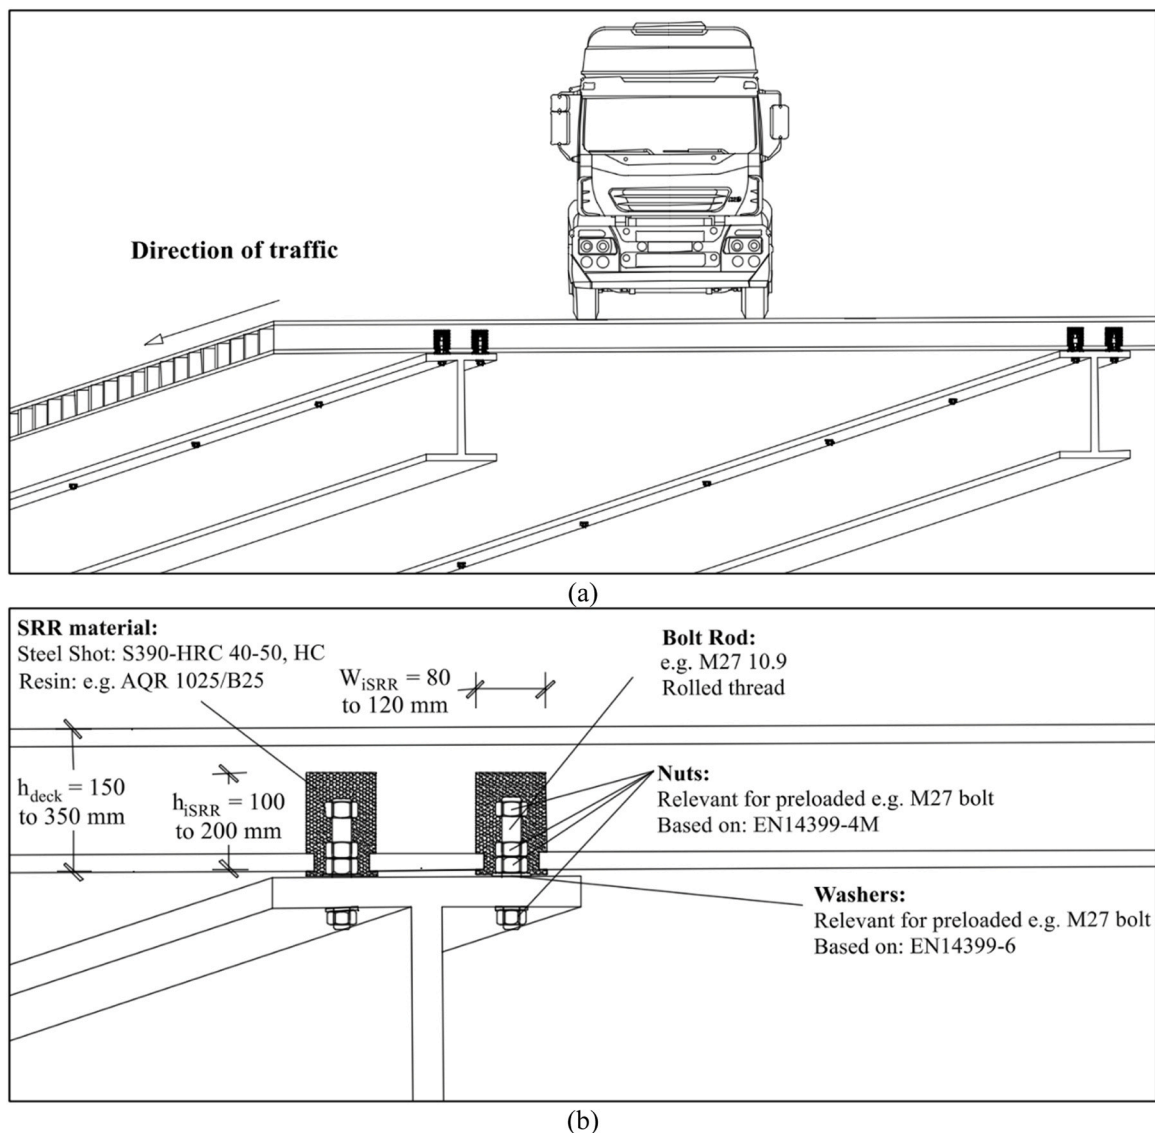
Cross section of a bridge with iSRR bolted connections between composite deck panel and steel girder: (a) Global view, (b) Close-up view of iSRR connectors [16,17].
